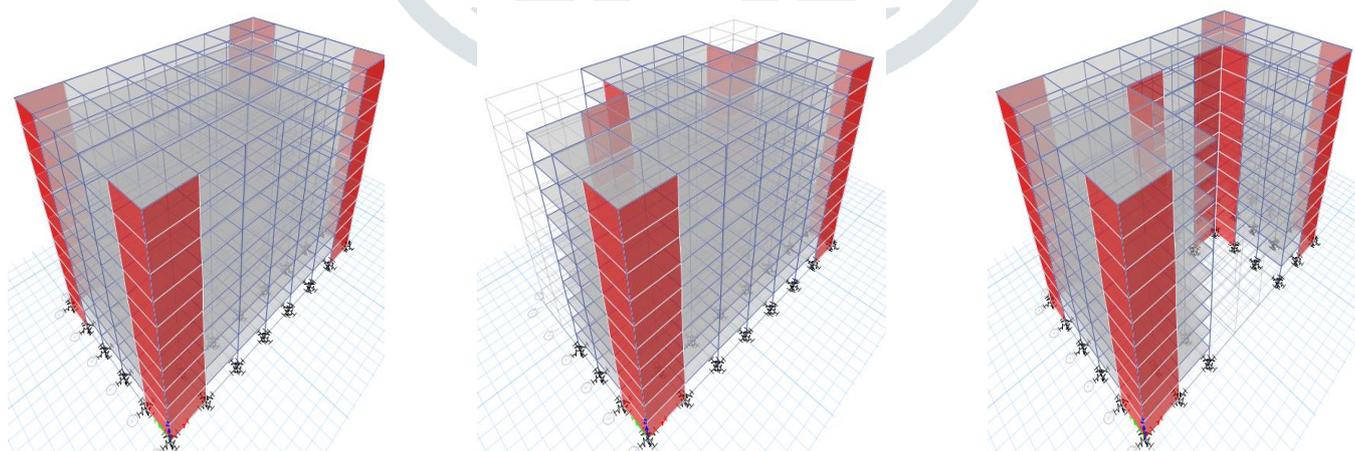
Elevation view of 10 storey having shear wall (a) Rectangle (b) T-shaped (c) C-shaped
